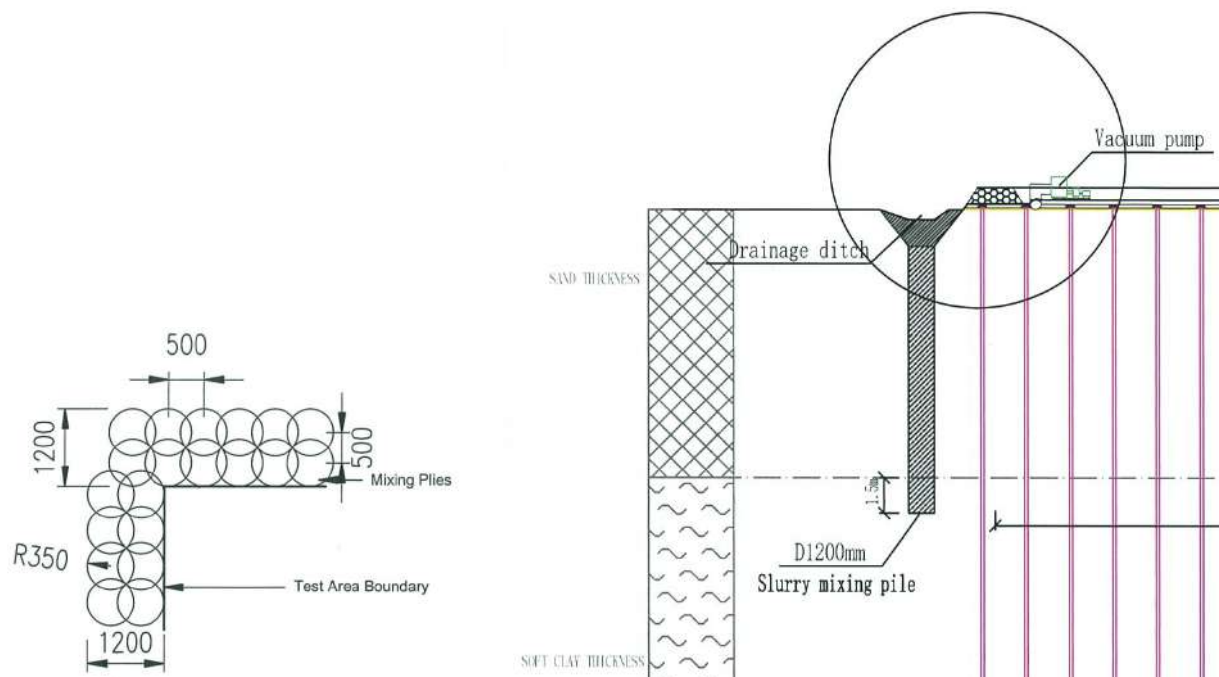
c Design of Deep Soil Mixing Slurry Wall
